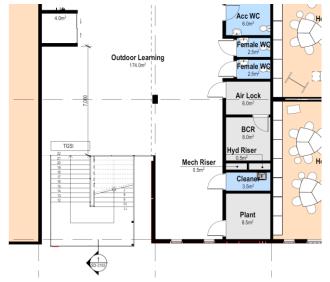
Extract of previously proposed Building J level 3 floor plan (Source: Fulton Trotter)
